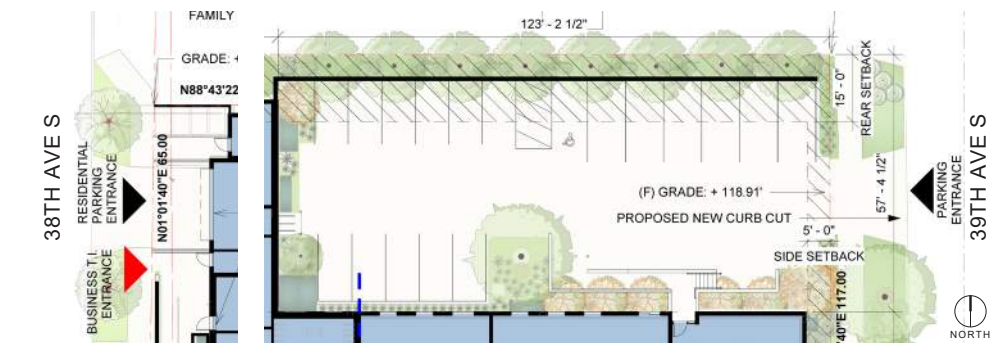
Site plan enlarged to show locations of vehicle entry.
